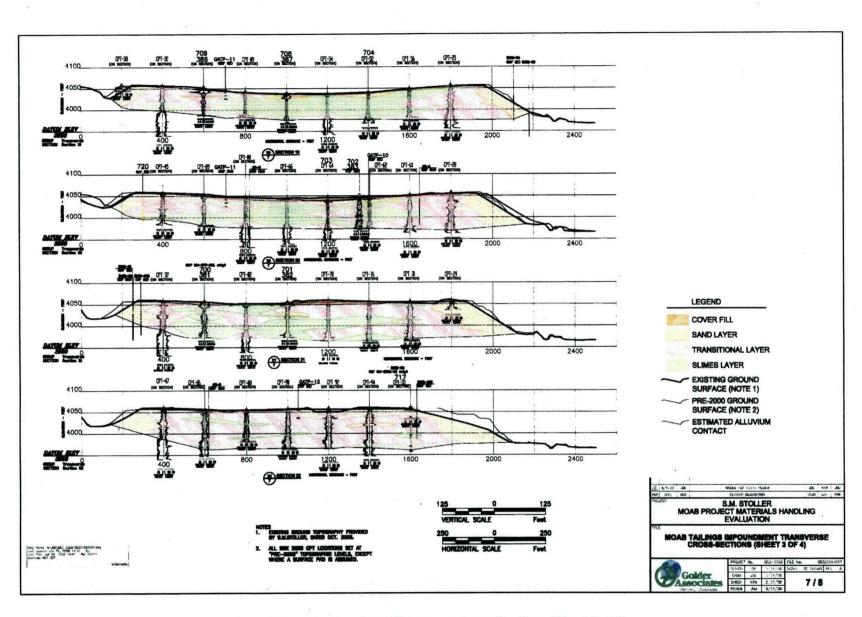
Moab Tailings Impoundment Transverse Cross Sections (Sheet 3 of 4)
